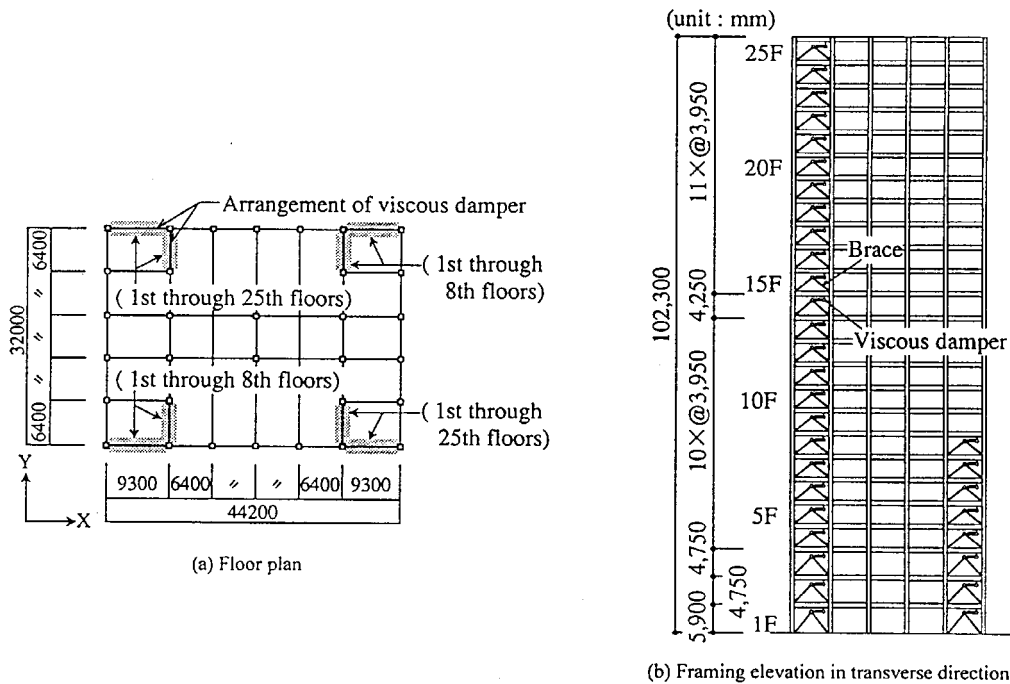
Outline of the building: (a) Floor plan; (b) Framing elevation in the transverse direction.
